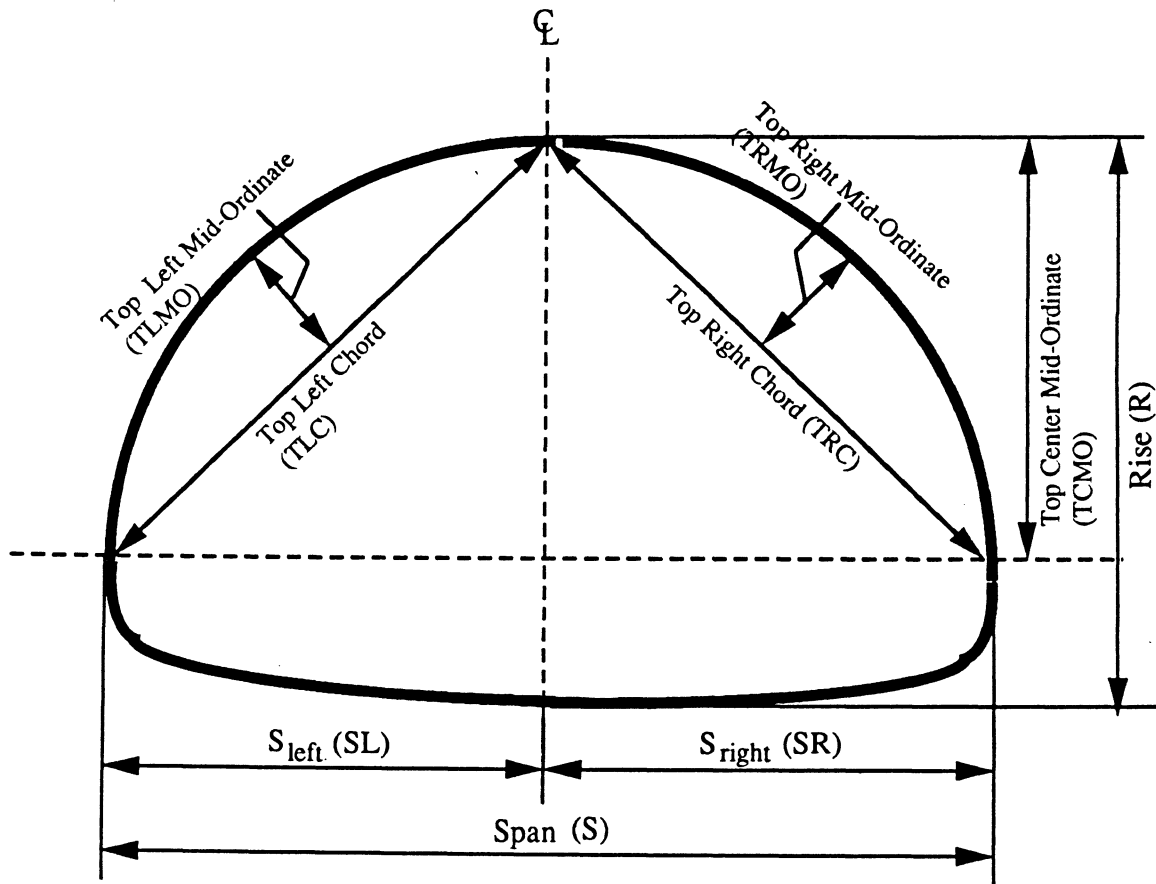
TYPES OF TAPE MEASUREMENTS
